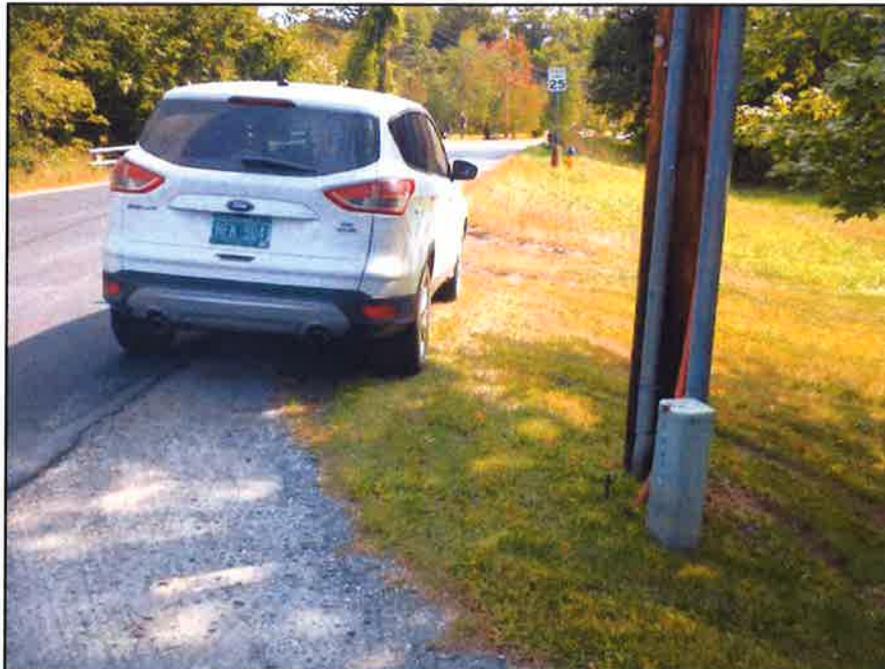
Photo shows the terrain on the road shoulder located between the American Legion and the area where Bloody Brook is located adjacent to the roadway. View is to the east.
